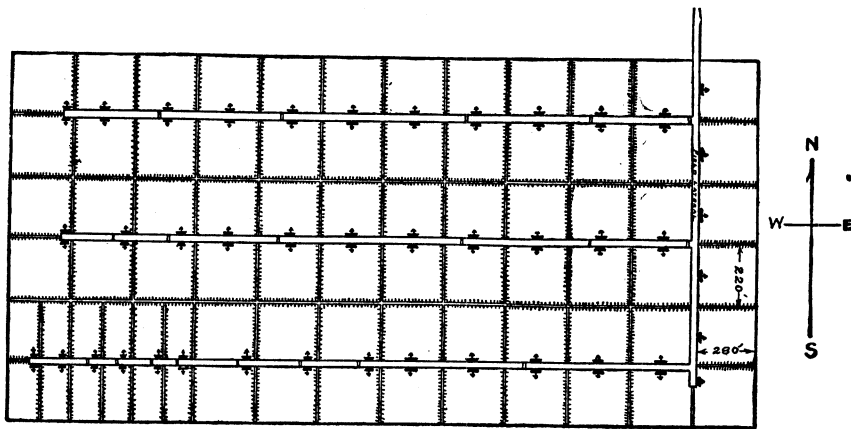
Layout of rectangular checks on a farm near Modesto, Calif.
